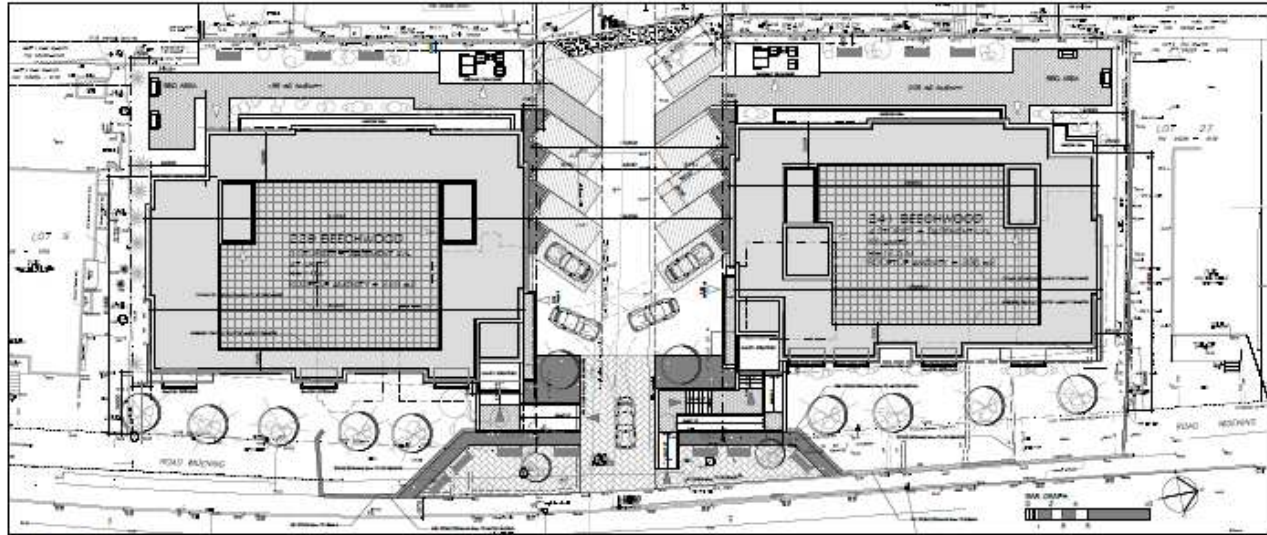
Site plan illustrating the proposed treatment of the grounds, including a small street park between the two buildings takes the opportunity to replace two street trees, and offering a place to sit while waiting for buses.
